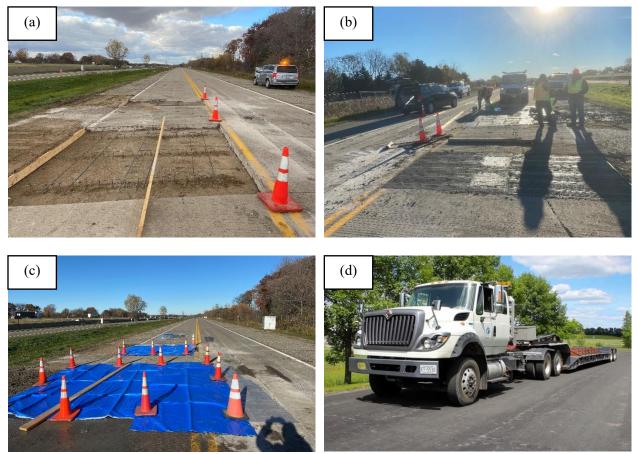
Construction process at MnROAD (a) old slabs being taken out and rebars set up for concrete panels, (b) construction completed on Nov. 2, 2021, (c) tarp coverage and curing for one month, (d) the 80,000-pound semi-trailer traveling around the closed-loop track at MnROAD
